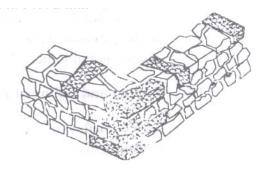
Interlocking stone wall with 'through' and 'corner' stones (very good construction)
